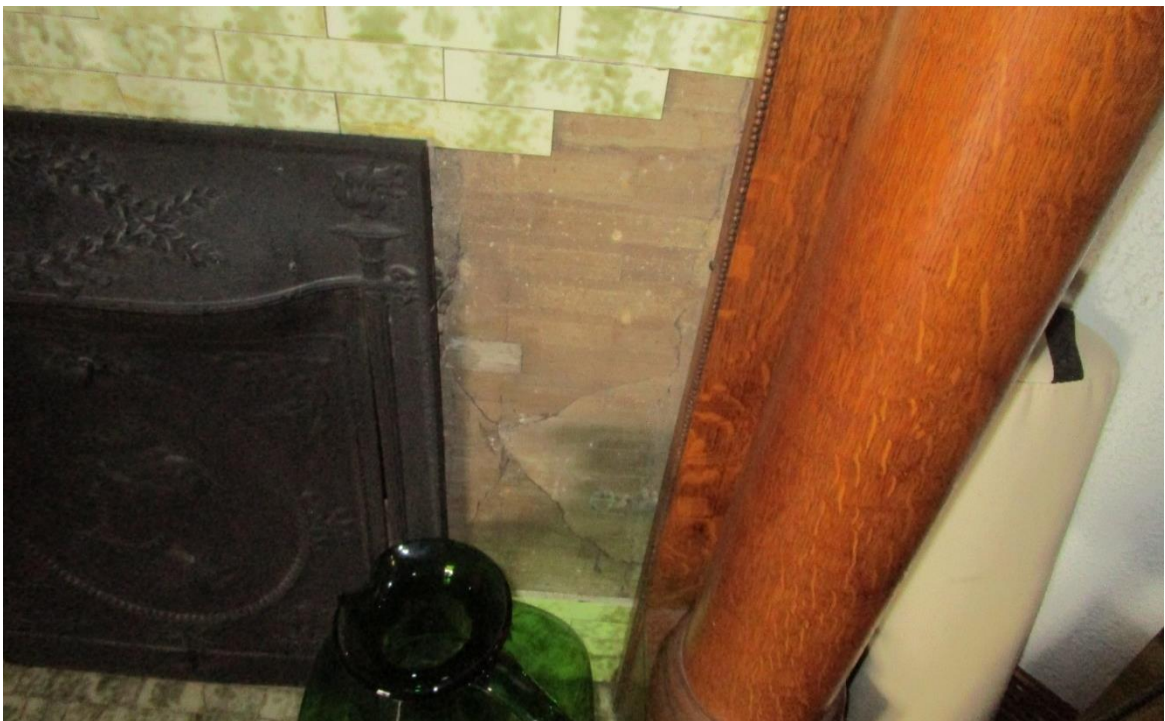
Tile missing from the right side of the fireplace surround. This may be due to a water leak or an overheating of the fire brick that is now exposed and cracked.
